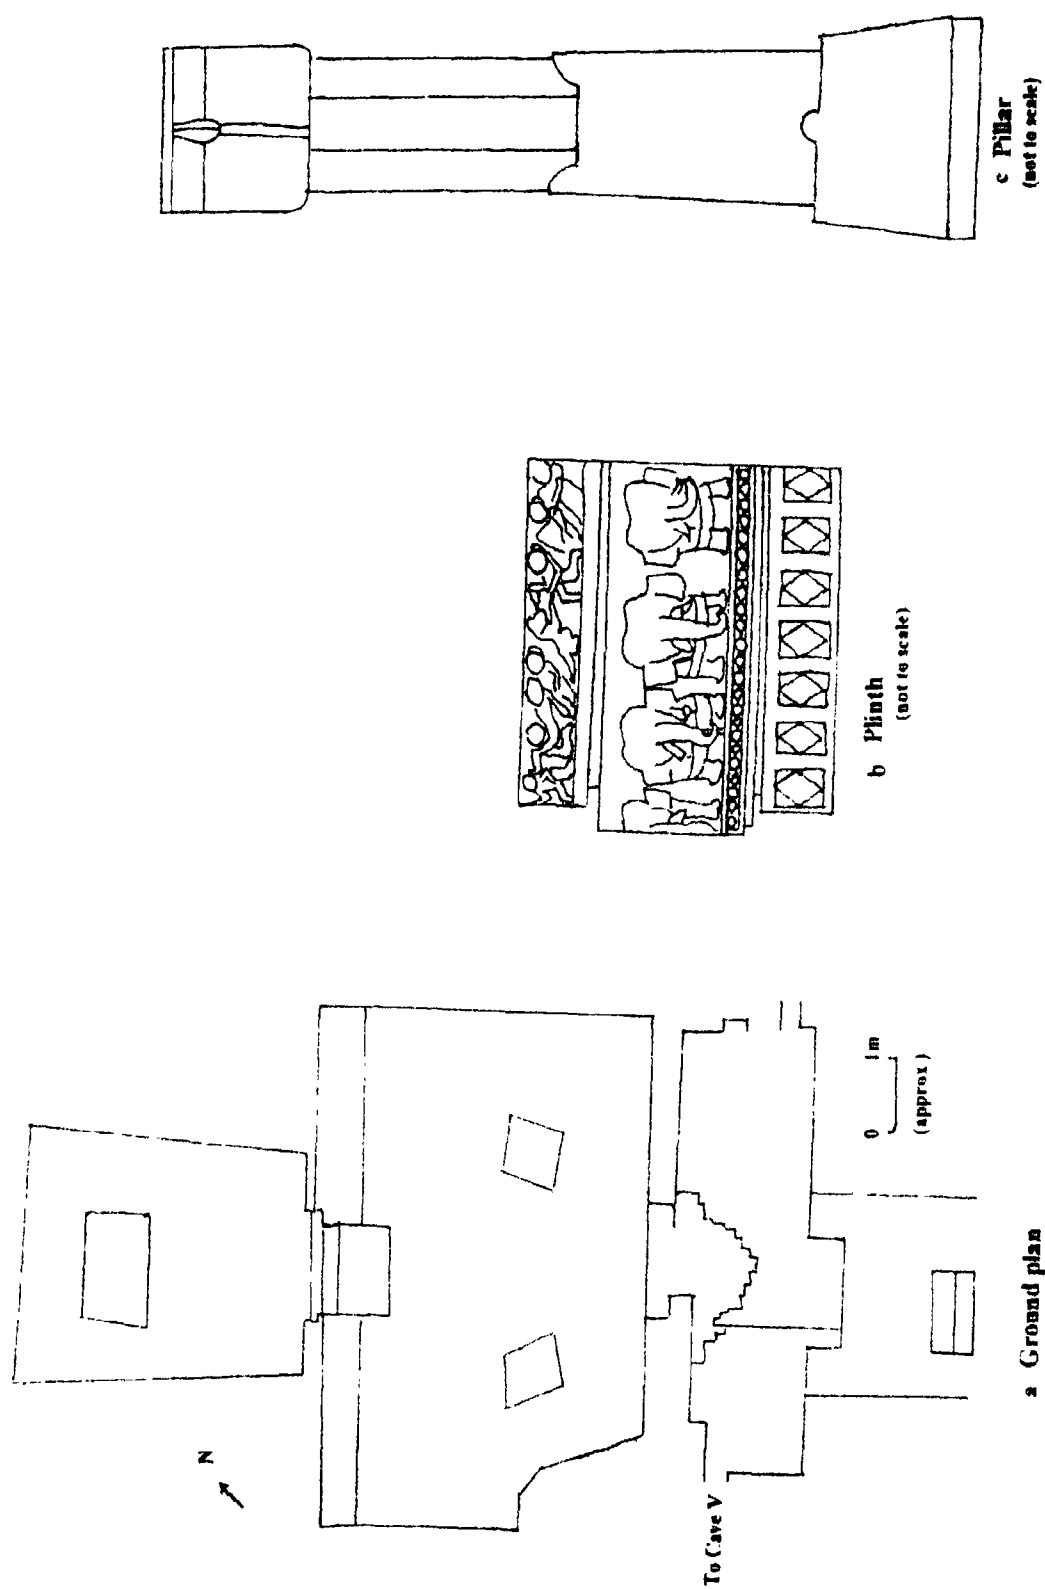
Ground plan, plinth and pillar of Cave VI at Ankai-Tankai
